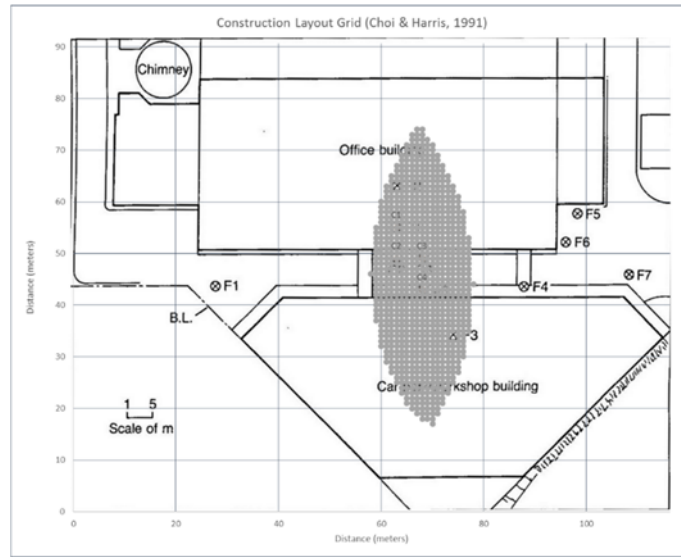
Site Plan With Feasible Tower Crane Locations (Choi & Harris, 1991)
